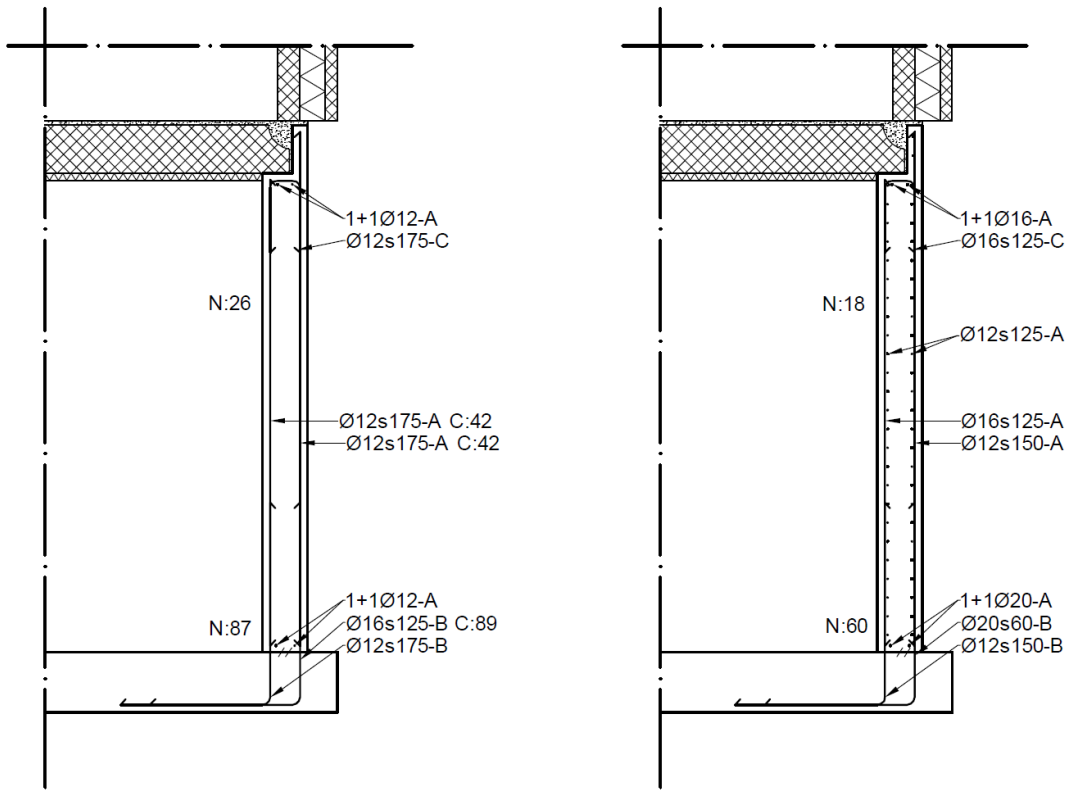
Wall reinforcement for GFRP with regard to requirements in ULS (left) and SLS (right).
